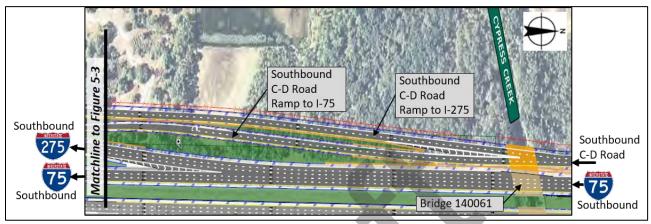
Alternative 1-Diverge Points for C-D Road & I-75/I-275
